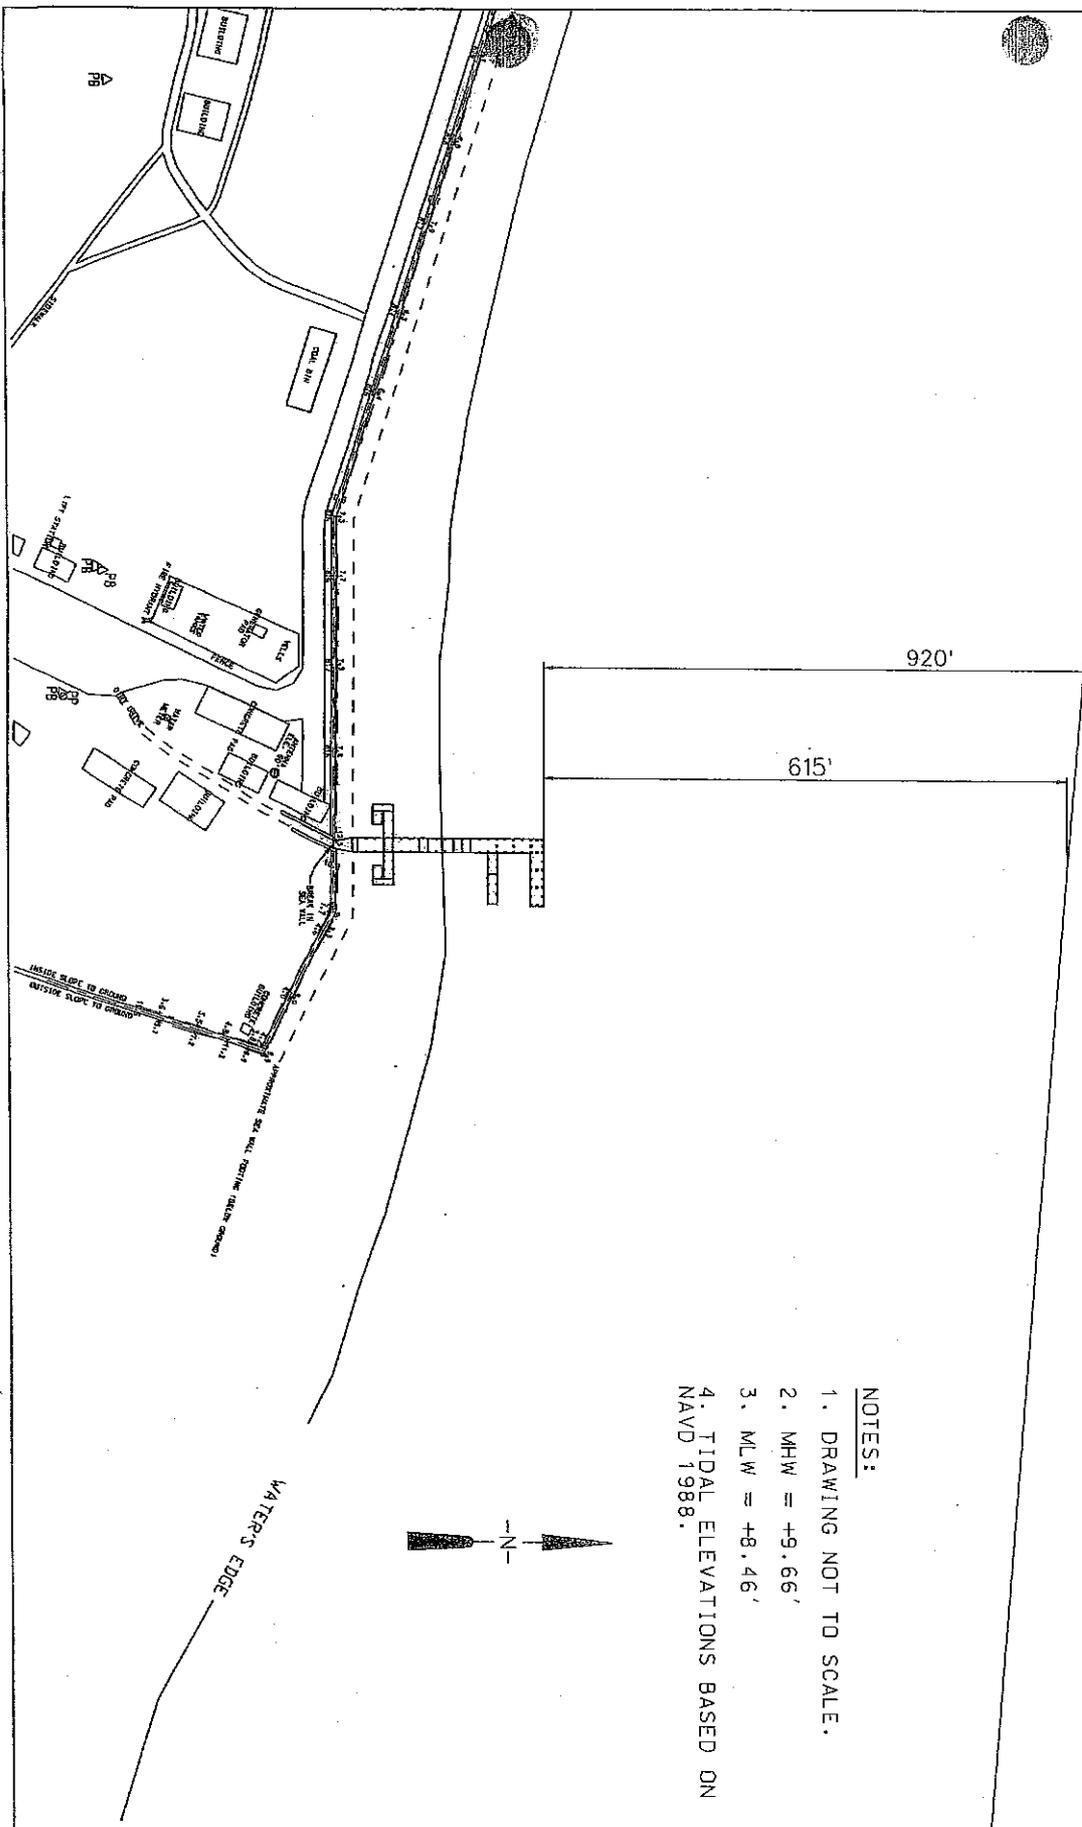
Aerial View of Fishing Pier and Proposed Project Site
